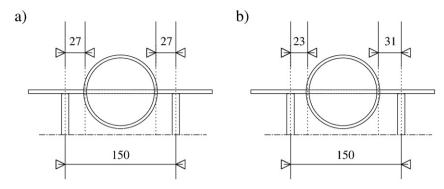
Beam cross-section at the supports: a) original plan; b) actual placement.
